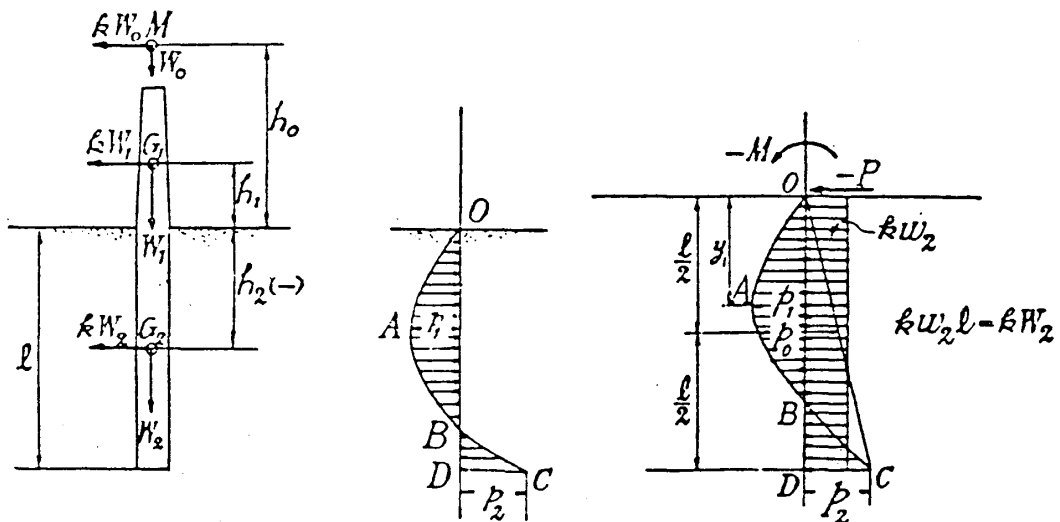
Stability Calculation Model of Caisson Foundation by Dr. Mononobe
